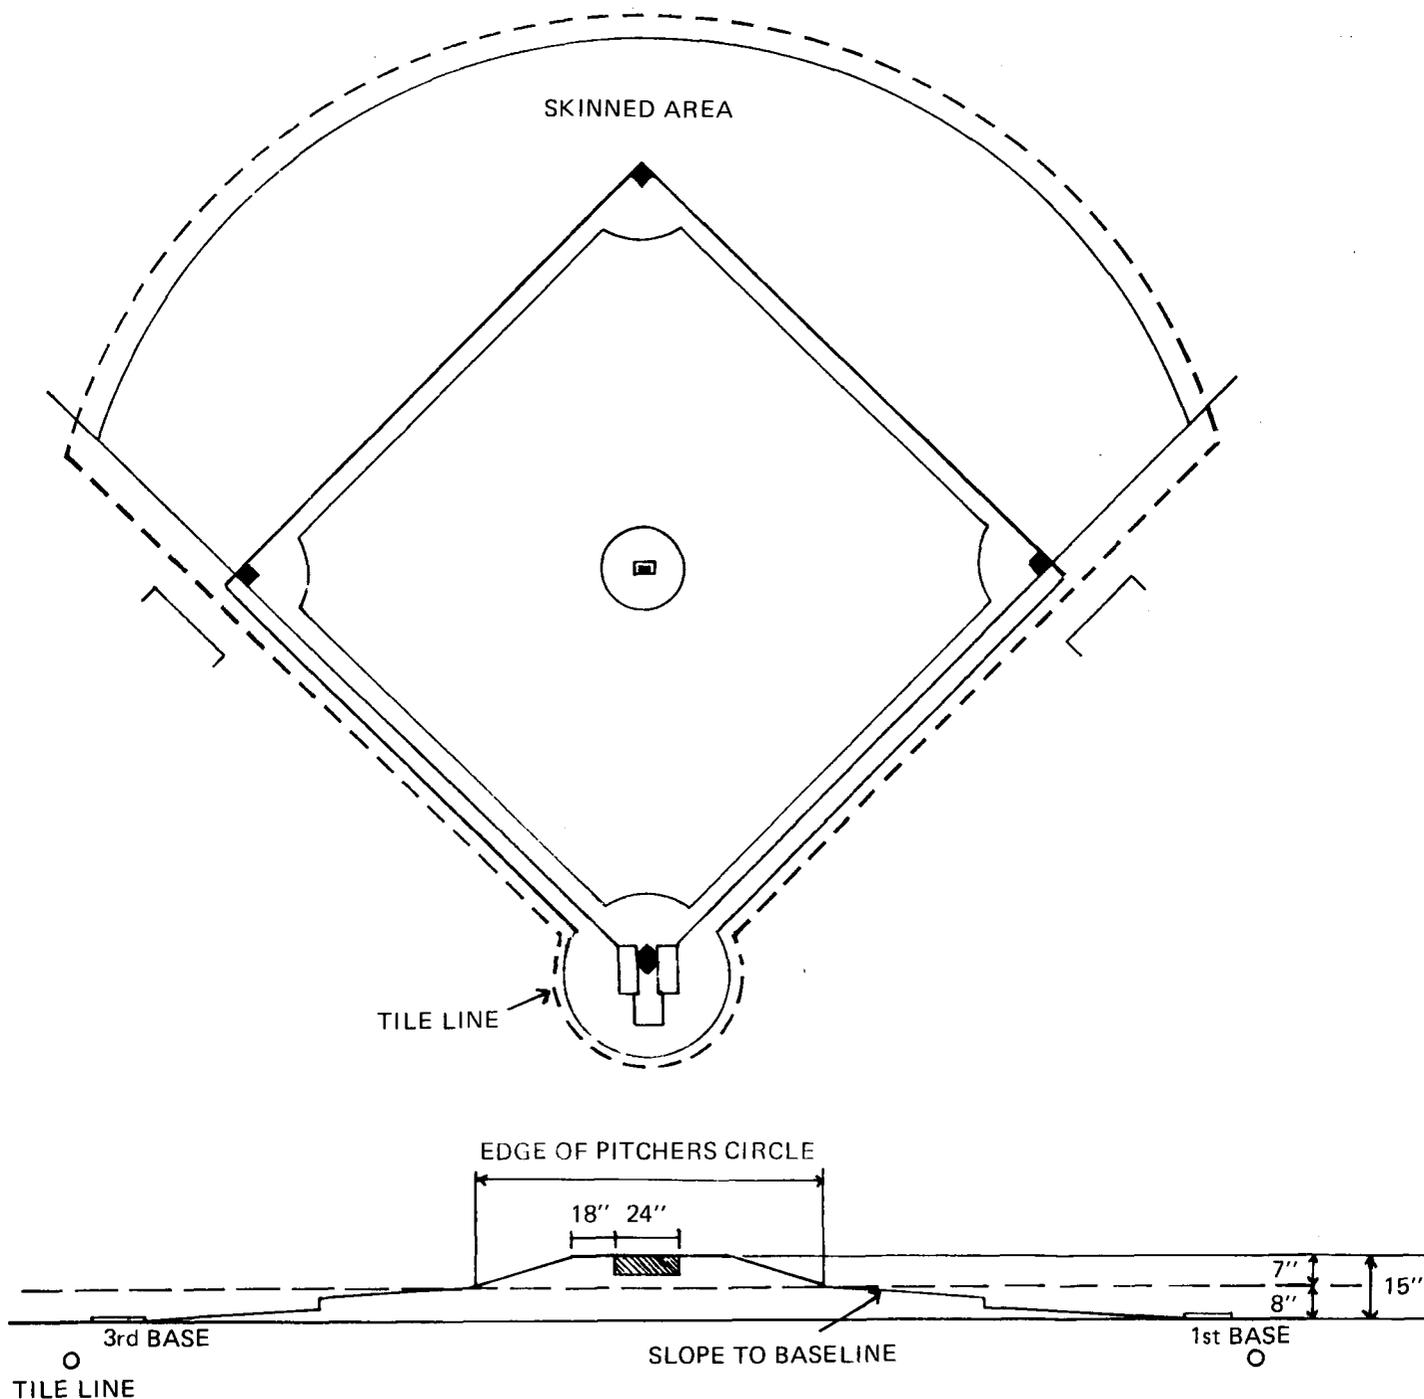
Diagram of a baseball in field with plans and elevations for surface drainage and drainage lines.
